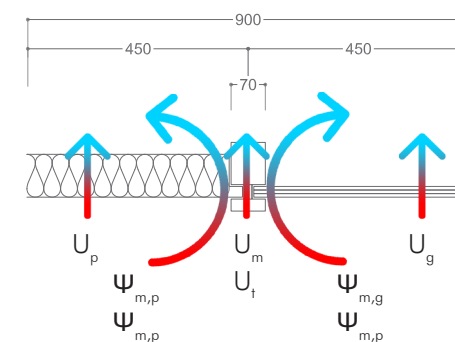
Enlarged plan view showing U & ψ - values exchange through typical curtain walls (Source – Author)
